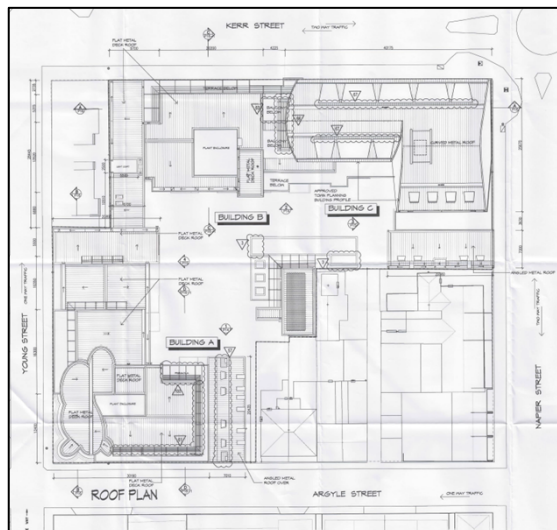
Excerpt from Endorsed Plans for PL06/0834, (development of land to the north of the subject site)
